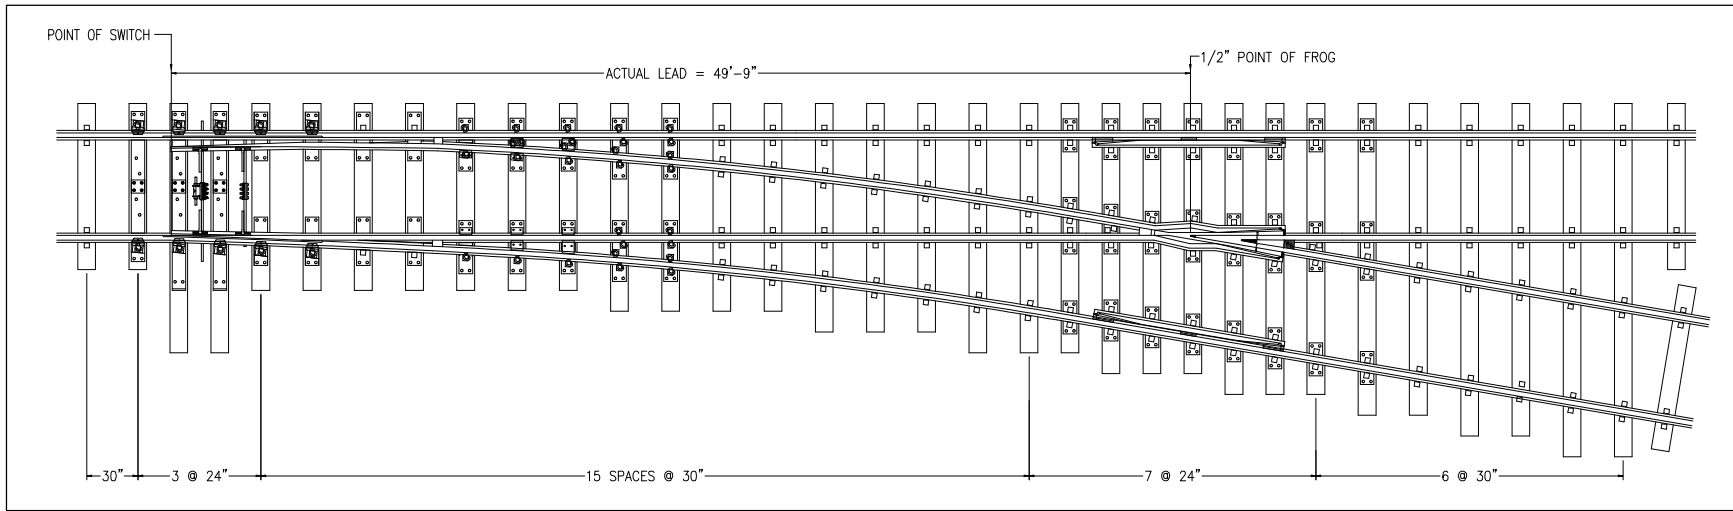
Optimized No. 6 transit concrete turnout spacing and layout
